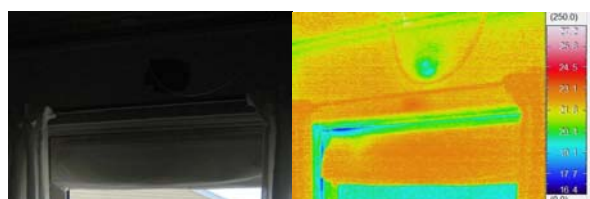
Untight window, natural vent and joints between the wall and the ceiling
